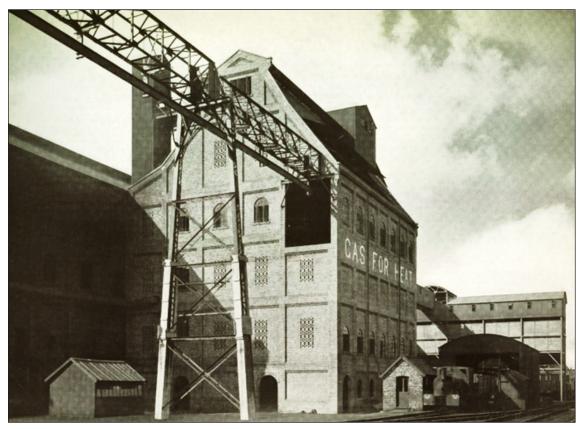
A typical example of a steel frames vertical retort house with Brick panelling at the former Garston Gasworks.
